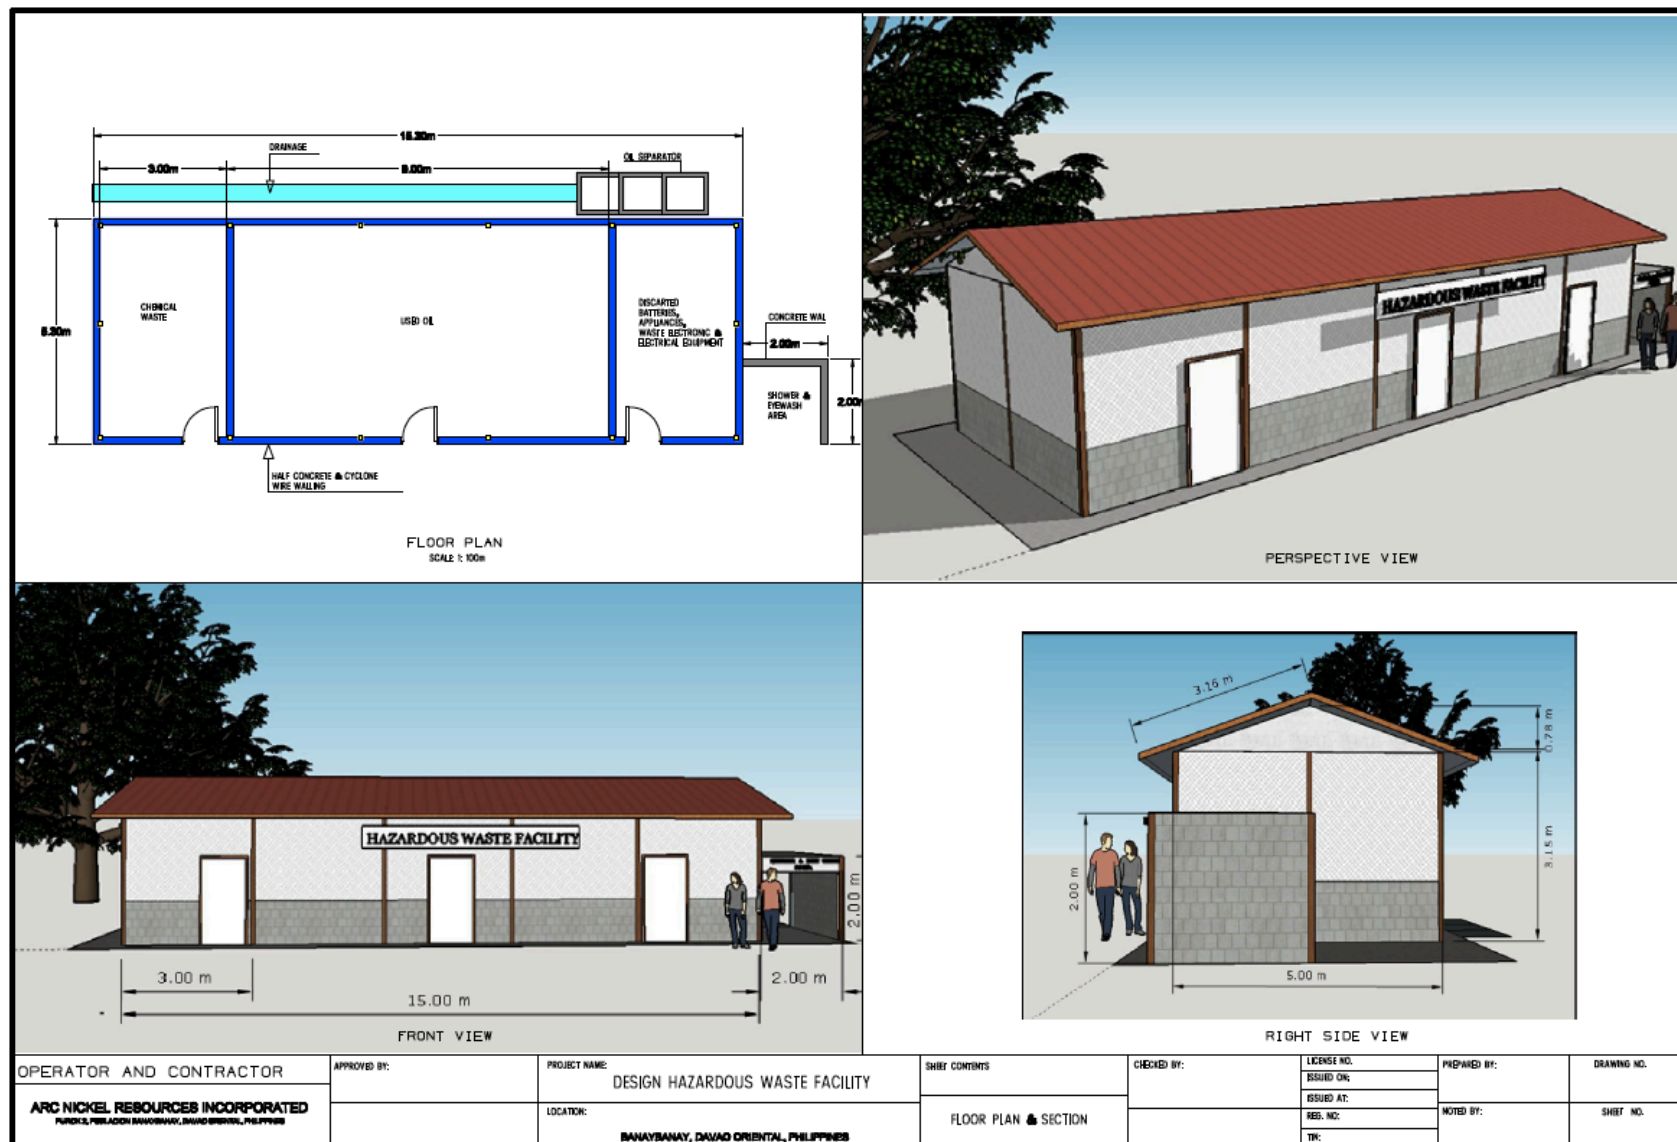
Hazardous Waste Facility Design (Source: RCMC)
